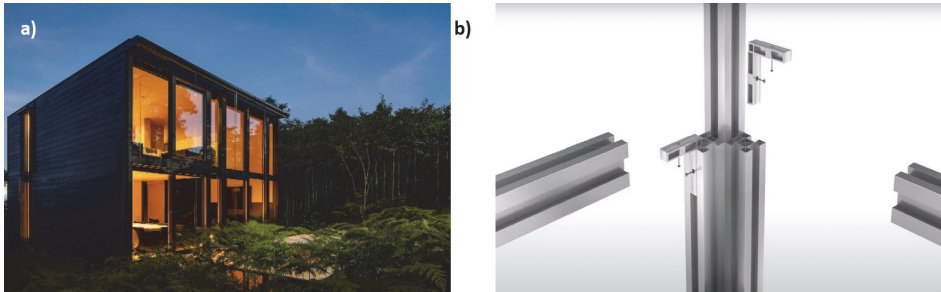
Pi Home: a) Modular aluminium structure, b) Innovative beam-to-column joint with screw grooves [42]
